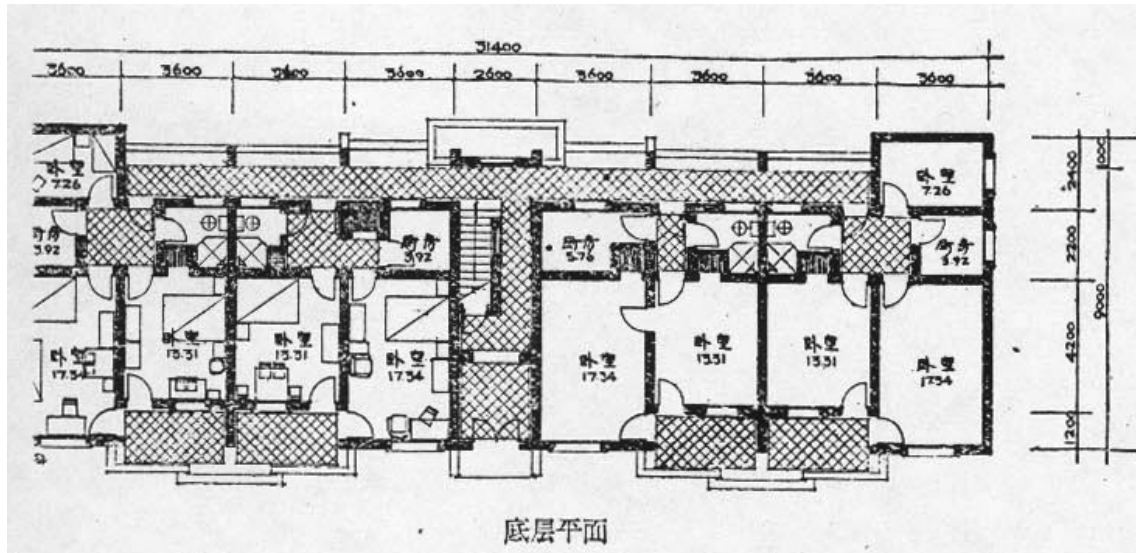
A “short open-corridor” housing plan, 1959-1960, Industrial Architectural Design Institute of Zhejiang Province
